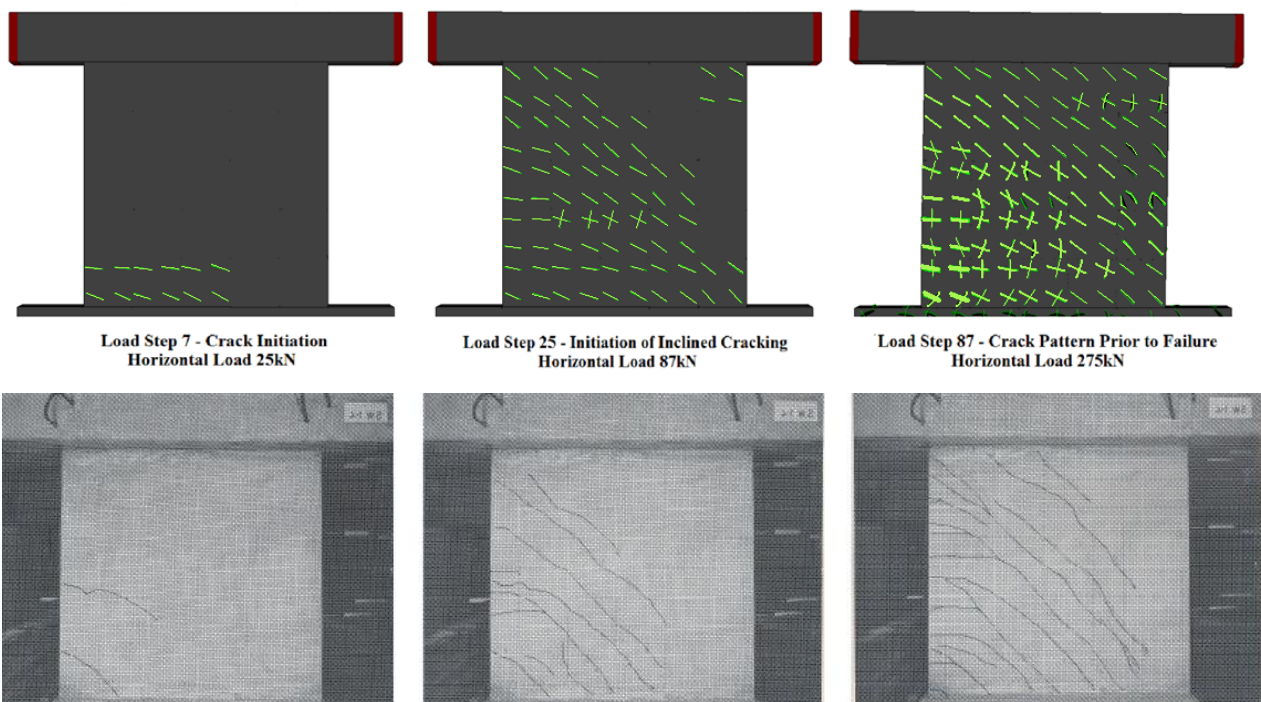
TYPE I RC SHEAR WALL. PREDICTED AND EXPERIMENTALLY OBSERVED CRACK PATTERN FOR DIFFERENT LOAD LEVELS OF SPECIMEN SW14.
